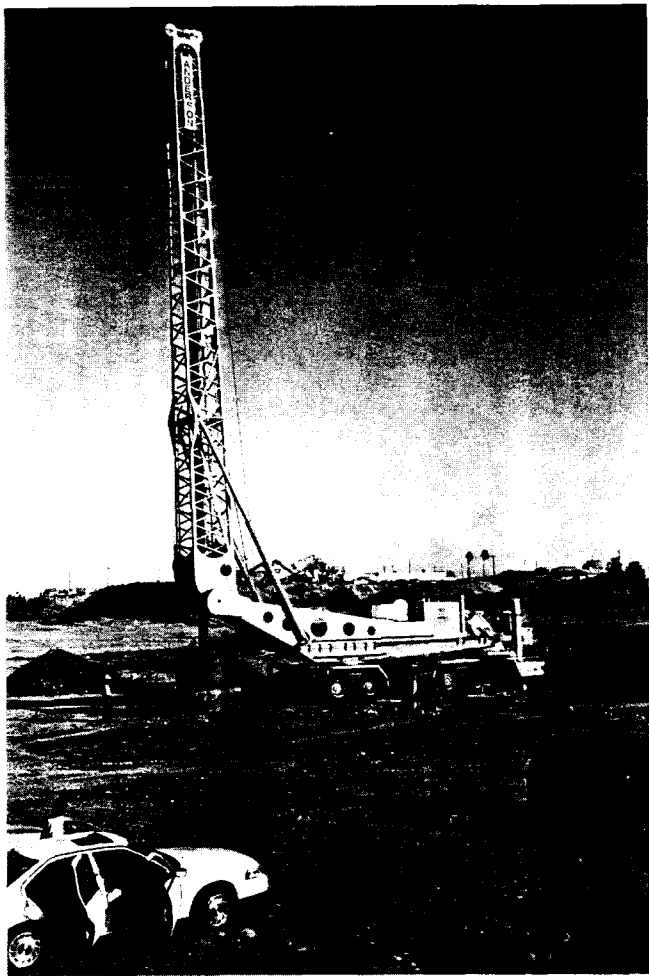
Extremely large drill rig capable of drilling 8 m (26 ft) diameter holes to depths of 60 m (200 ft) (Anderson Drilling Co.)
